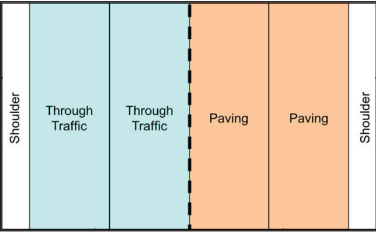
Sequential Construction - Reconstruction of Two Lanes
